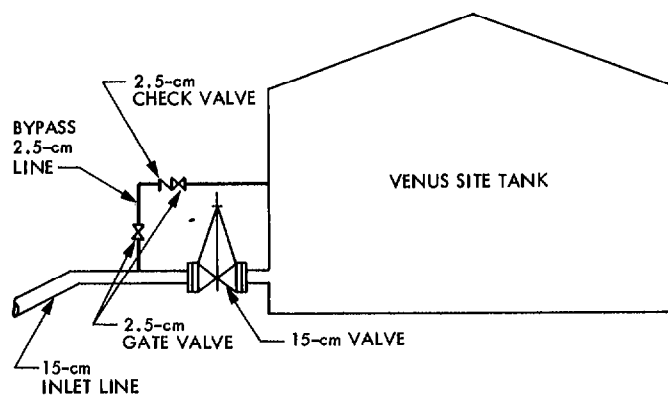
2.5-cm bypass line at inlet to Venus Site tank
